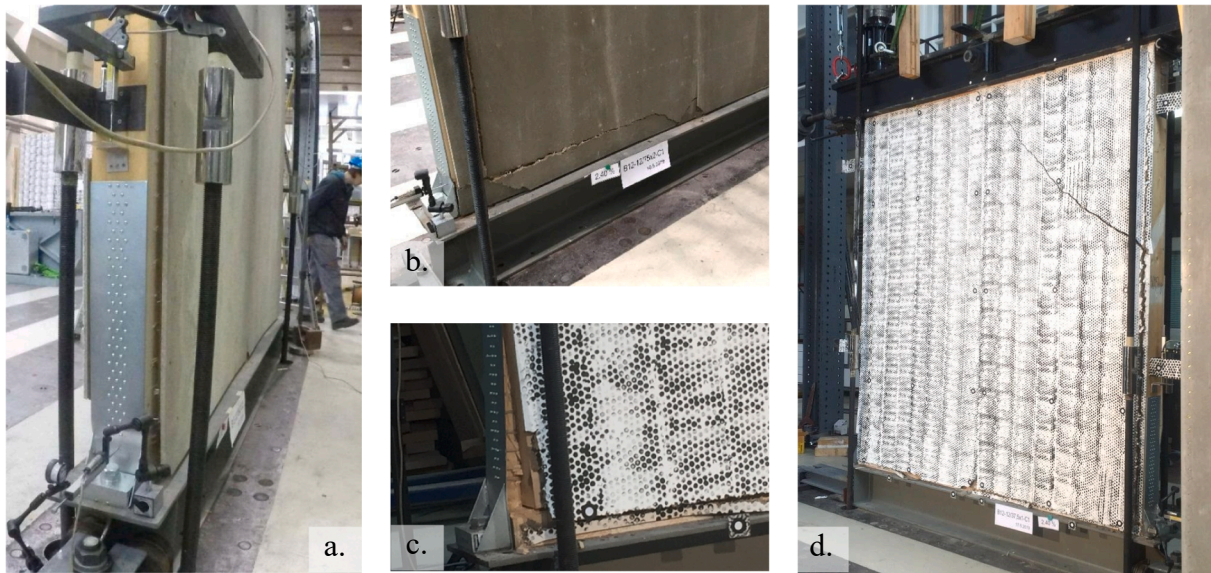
a. Plastic deformations and withdrawal of staples in the B12-12/75x2 panel; b. CPB failure along the connections in the B12-12/75x2 panel; c. Failure of the CPB in the sheathing-to-timber connections of the B12-12/37.5x1 panel, with damage to the outer stud; d. Failure mechanism of the B12-12/37.5x1 panel, with a diagonal crack in the CPB.
